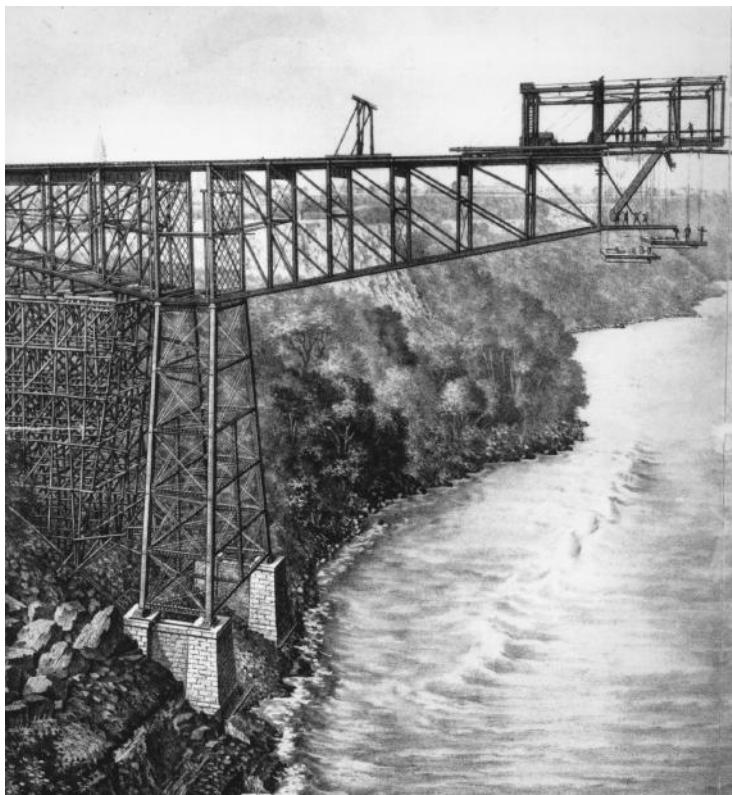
Niagara River railway cantilever truss bridge, near Niagara Falls, New York, 1883. Massive wood erection traveler constructed side span on falsework, then cantilevered half of main span to midspan. Erection of other half of bridge was similar. First modern-type cantilever bridge, with 470 ft. (143 m) clear main span having a 120 ft. (37 m) center suspended span.
